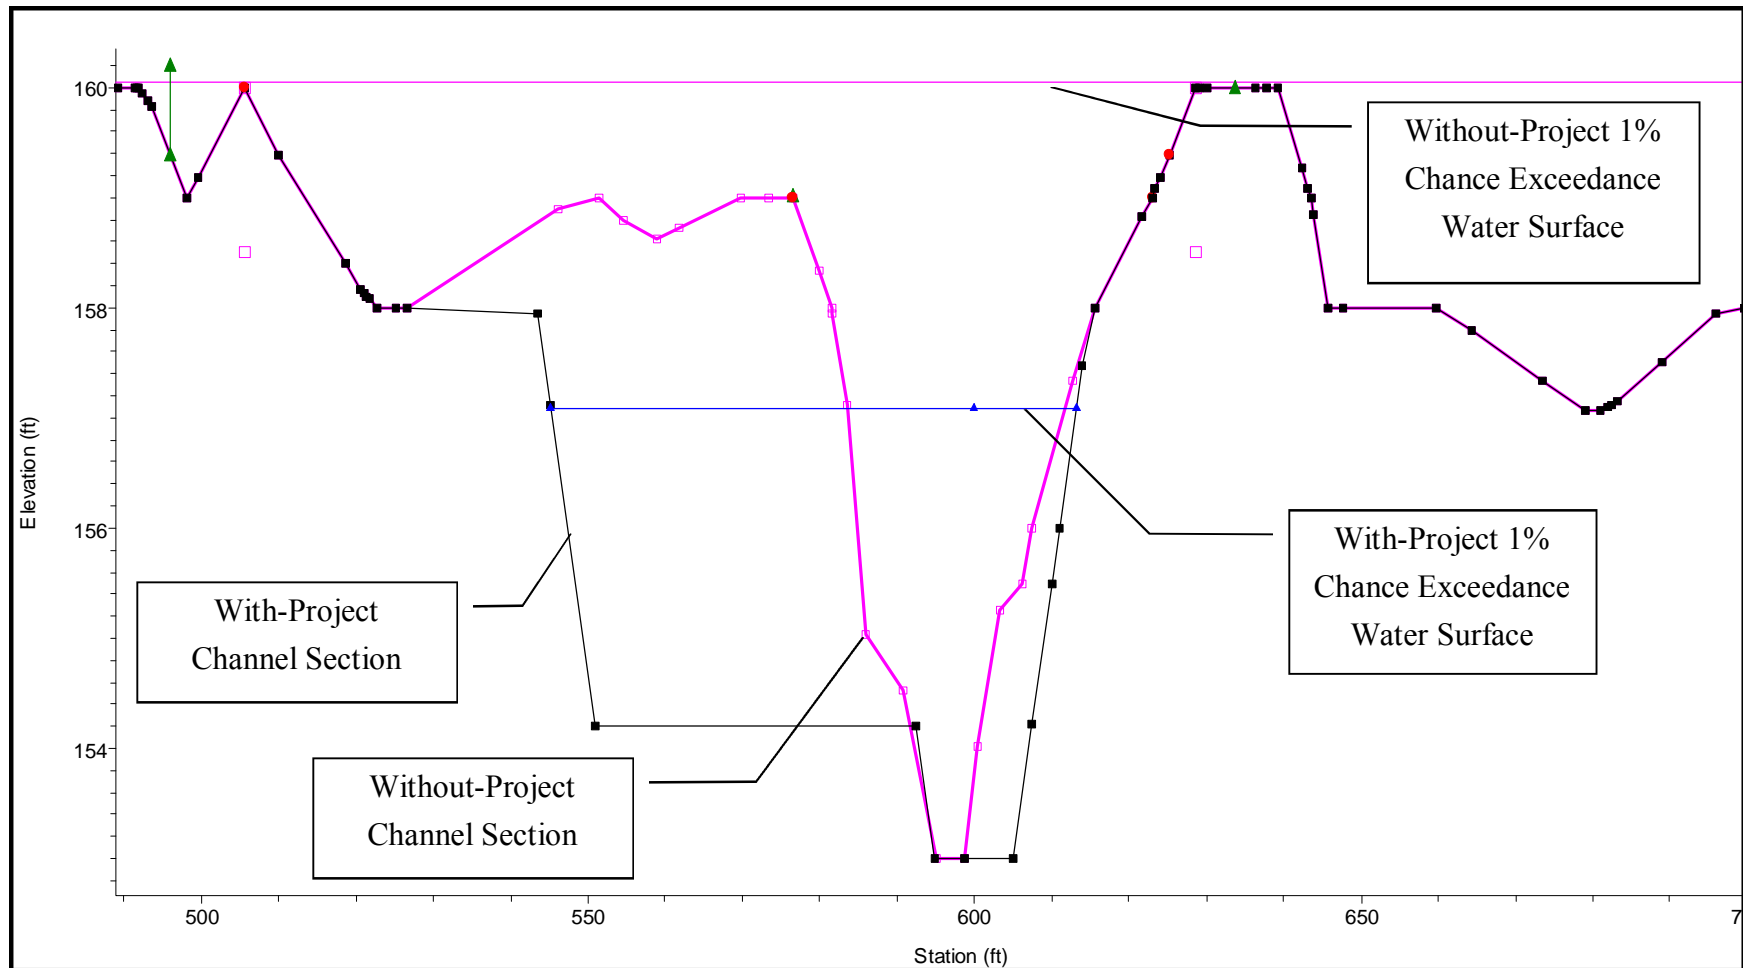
Typical U/S section, with- and without-project geometry for B Alternatives
